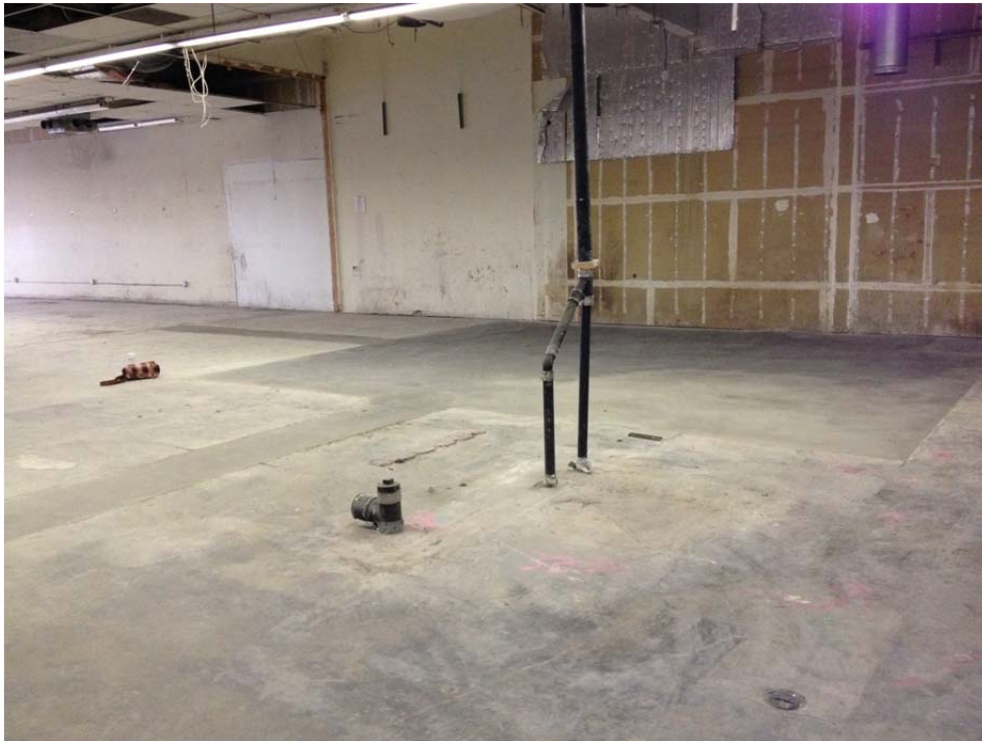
Completed sub-slab depressurization system vault box located at rear of 7102 tenant space.
